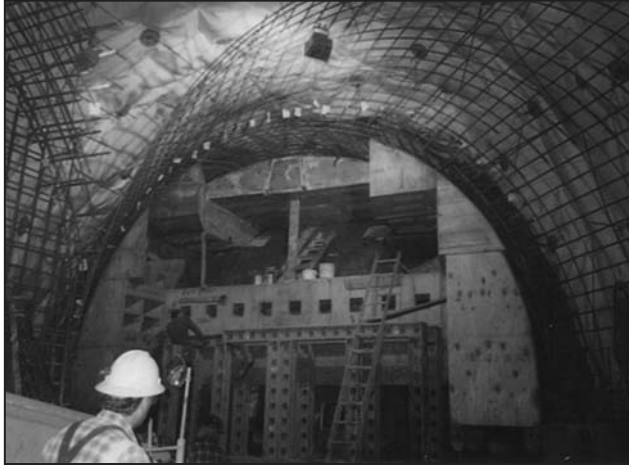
Telescopic formwork—expanded full-round tunnel form with concrete injector in place
